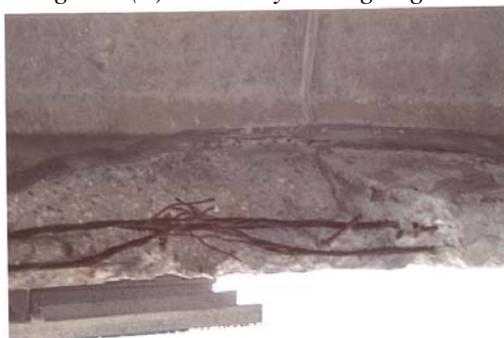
(b) – Significant Loss of Concrete and Damage to Steel Reinforcement
